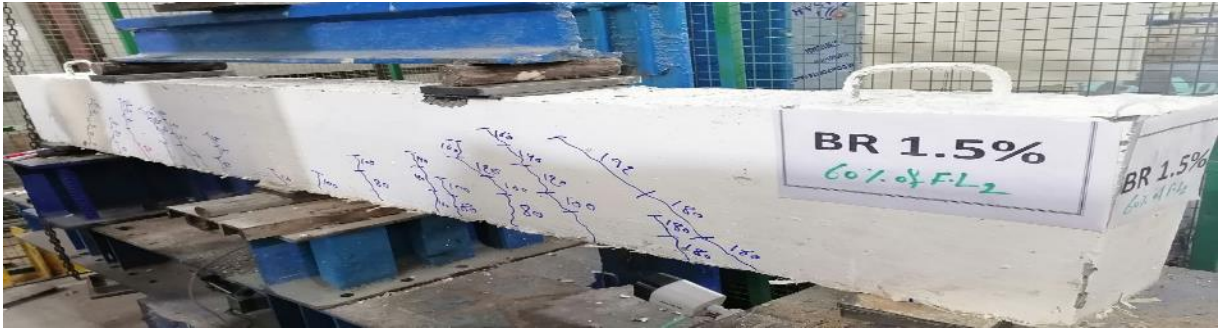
Beam No. BR1.5% at the first stage of testing (60% ratio of loading)
